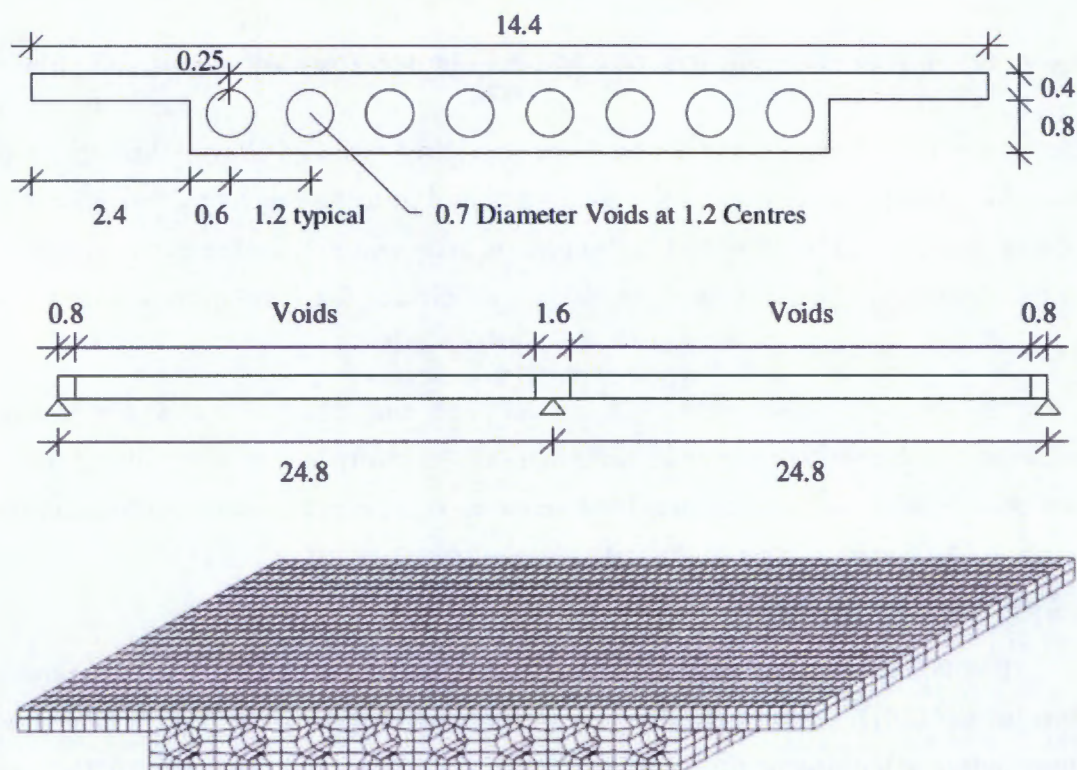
Cross-section, longitudinal elevation, and 3D FE model of the voided slab deck (O'Brien & Keogh (1998)).
